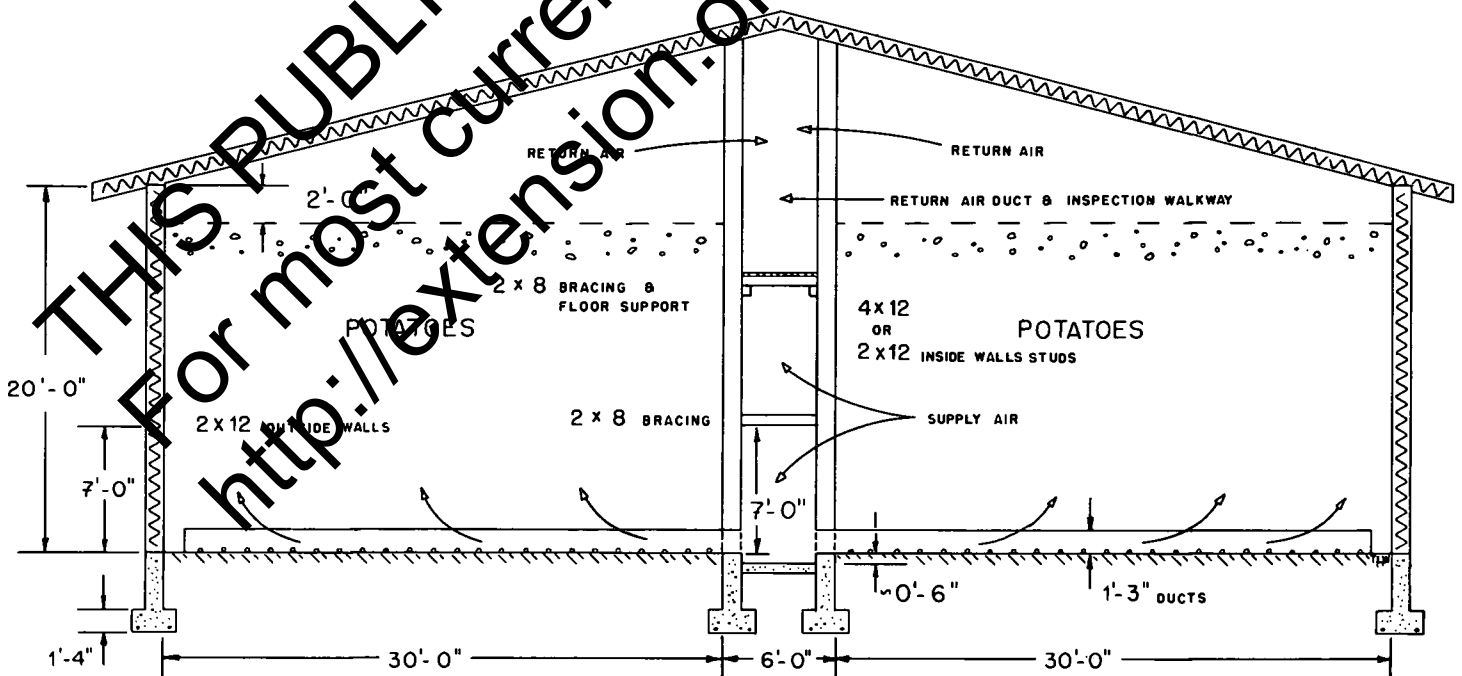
Elevation view of a bulk potato storage with braced outside walls
